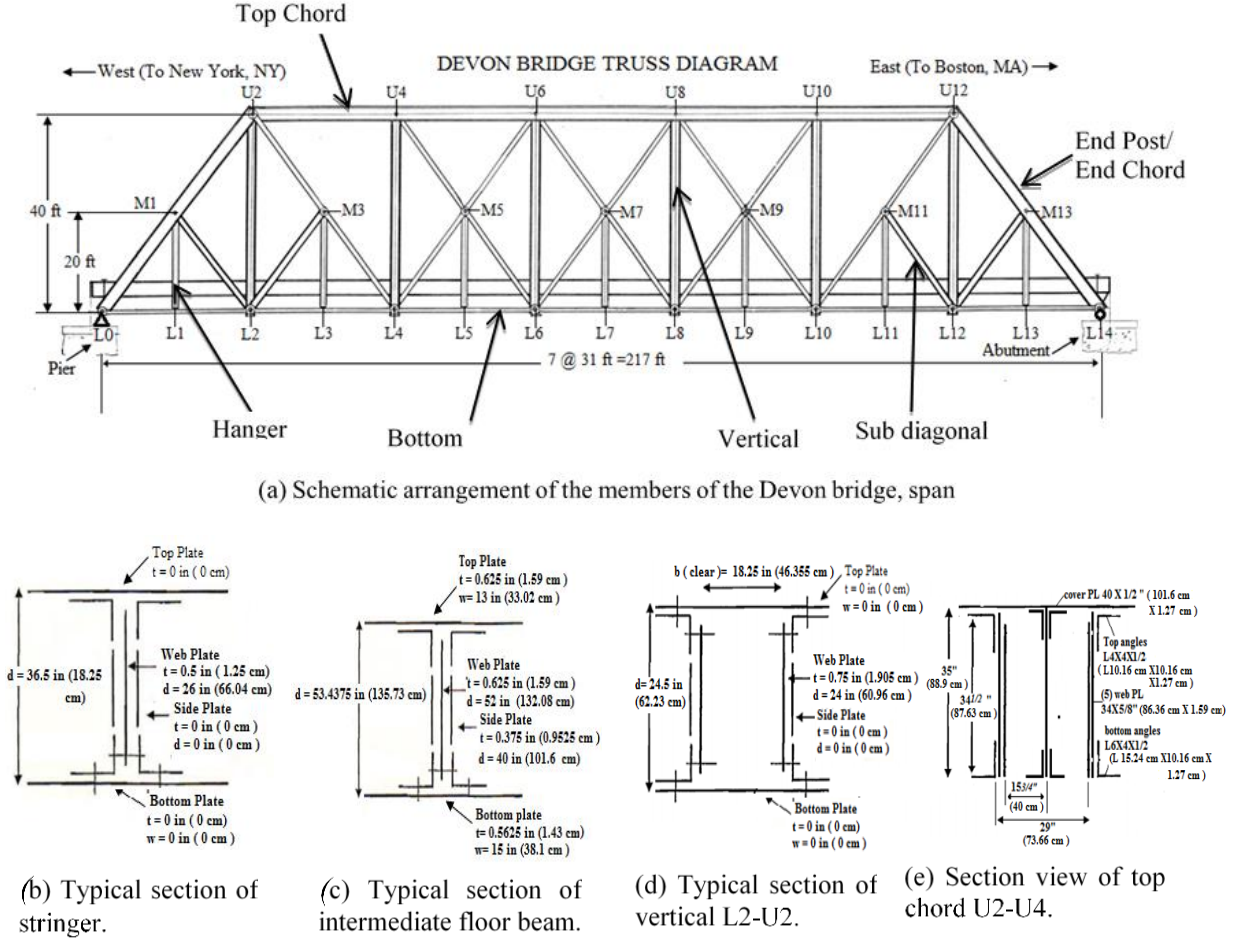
Schematic arrangement of the principal members of the Devon Bridge, span 7, and typical sections of stringer, floor beam, vertical and top chord.
